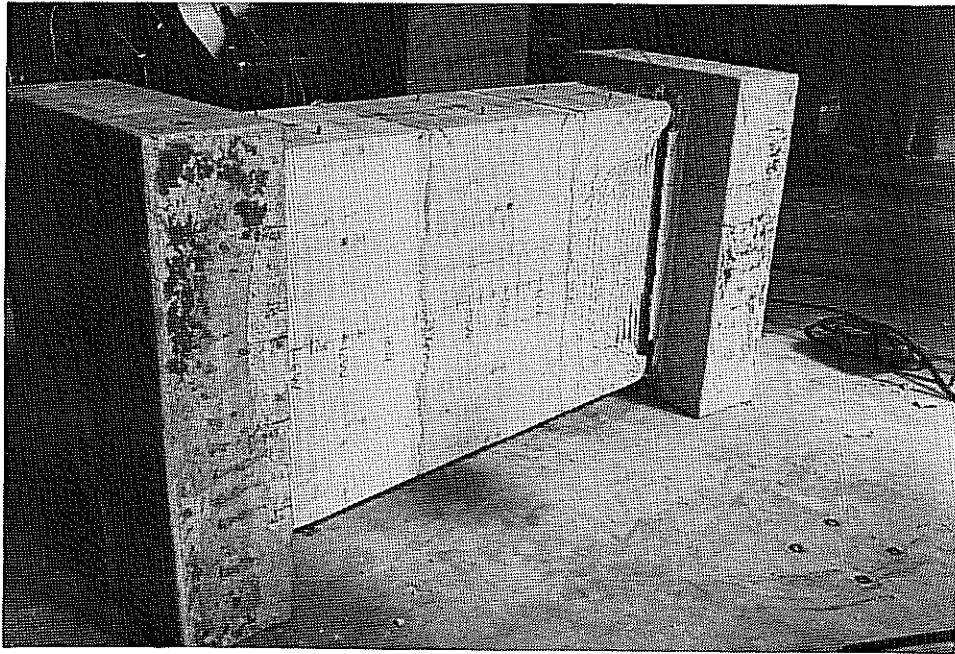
Specimen 11ML34 Compression Flange Displacement at Failure
